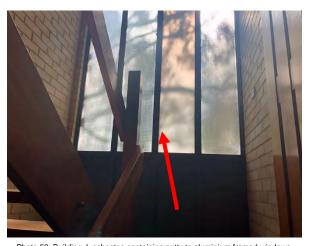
Building J, asbestos containing putty to aluminium framed windows
